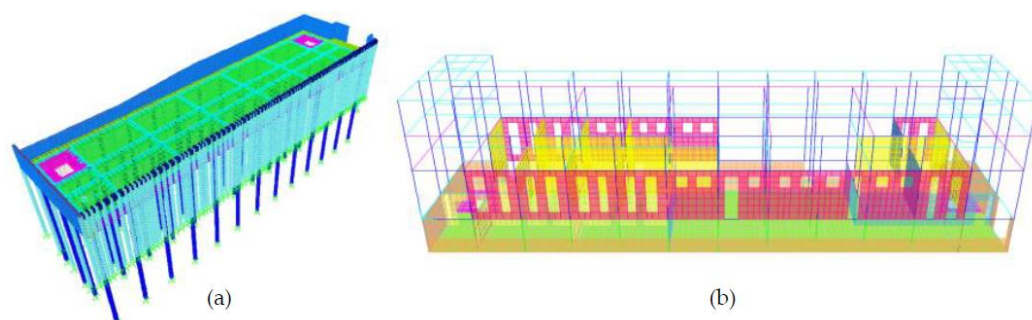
Modelling details: (a) foundation system, (b) infill walls of the first elevation.
